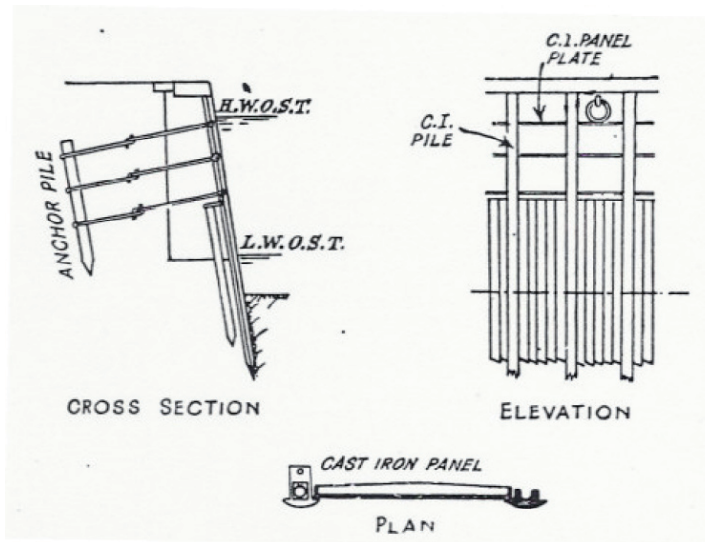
Cross-section and elevation of Brunswick wharf, London 1834 [Duplat Taylor 1949]
